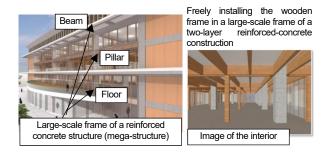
Example of the prototypes of frame form in mixed structure architecture
